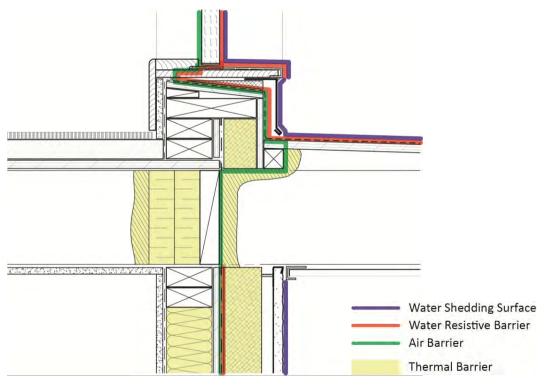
Detail 7-SI – Location of Critical Barriers
